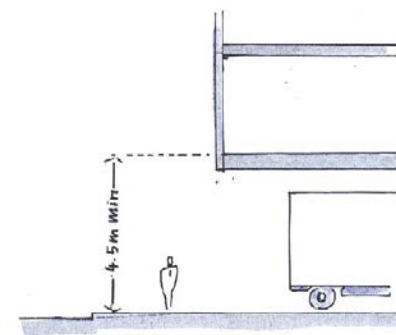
Minimum 4.5-metres ground floor ceiling height to accommodate service vehicles
